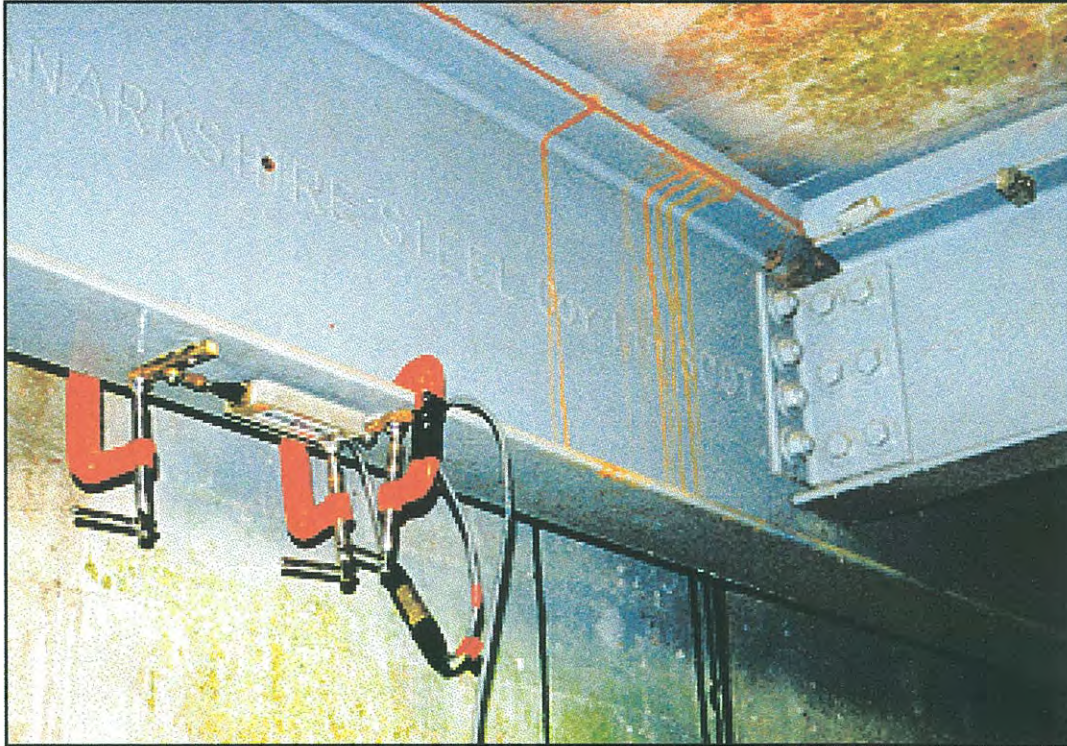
Instrumentation on the abutment cross girder by Stringer 3.
